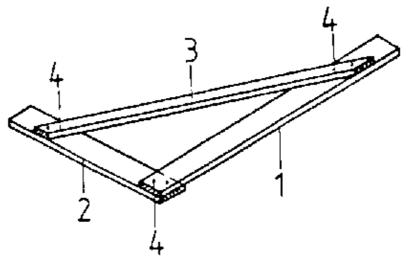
A builder's square – 1 longer, straight strip for true alignment, 2 shorter, straight strip for true alignment, 3 strip for stiffening (bracing) the two straight strips, 4 nail
